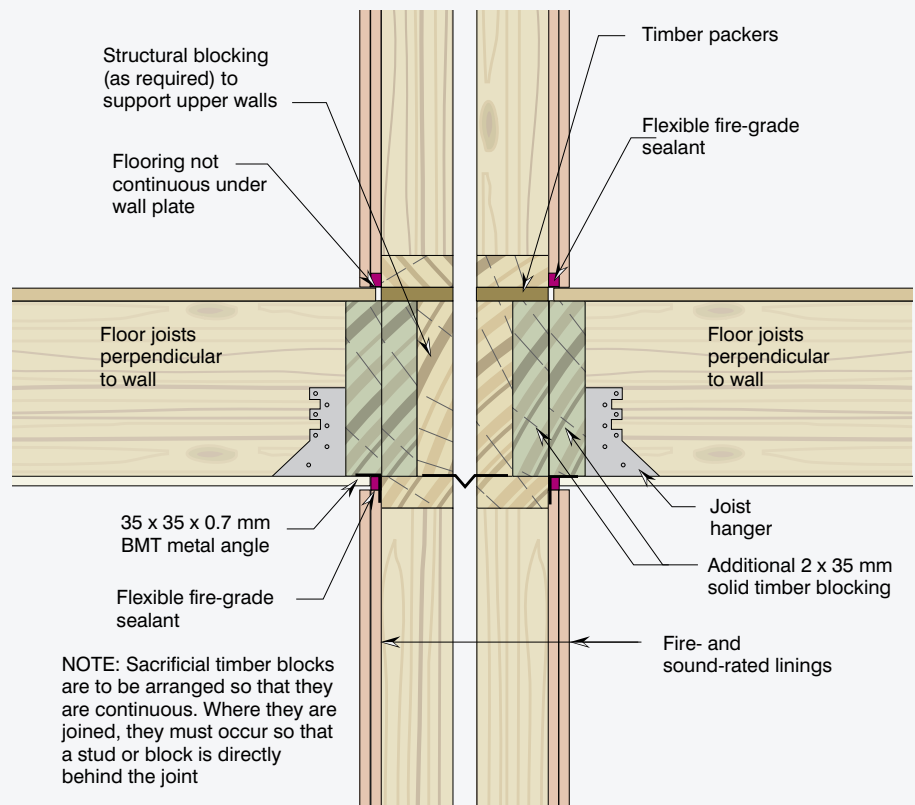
Joist perpendicular to wall, wall stud not continuous through junction – FRL 90 minutes – elevation view.
